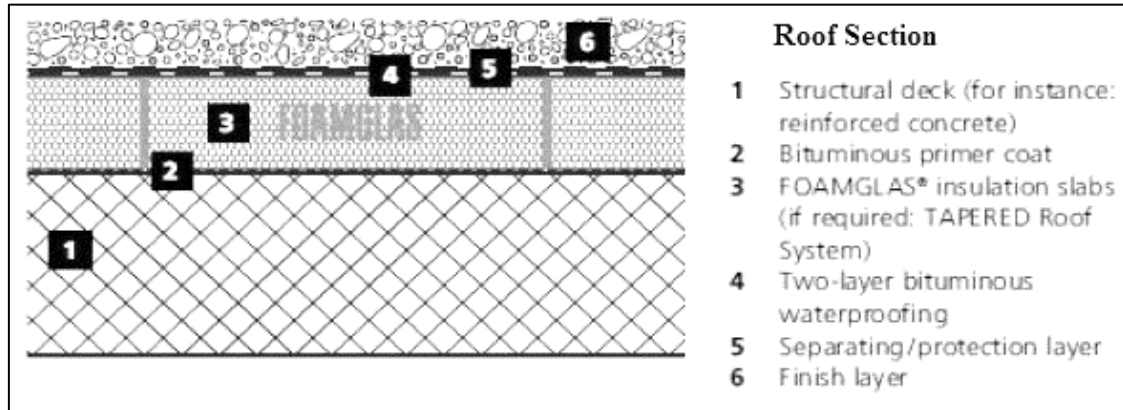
Typical section in the reinforced concrete roof with thermal and waterproof insulation layers (Abdulrahman, 2014)
